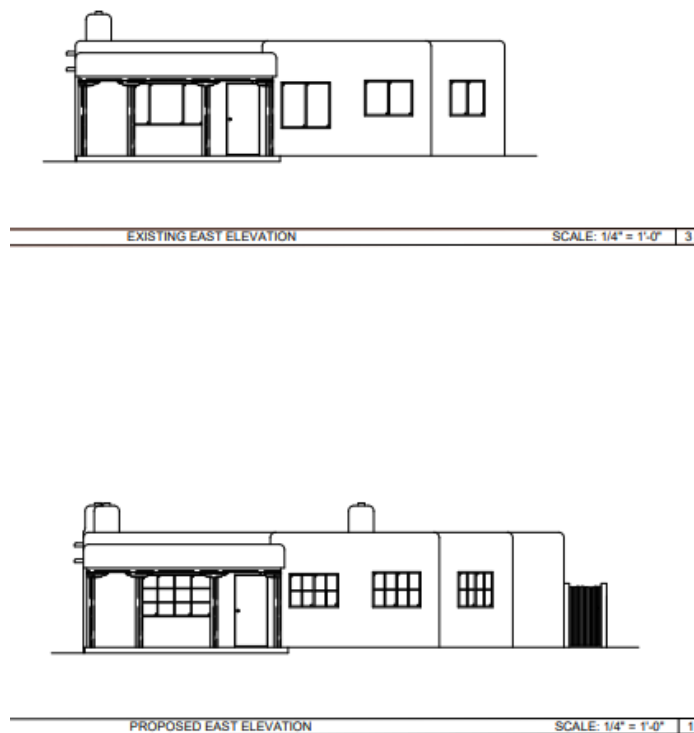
Existing and Proposed East Elevation and Primary Facade of the main residential structure.
